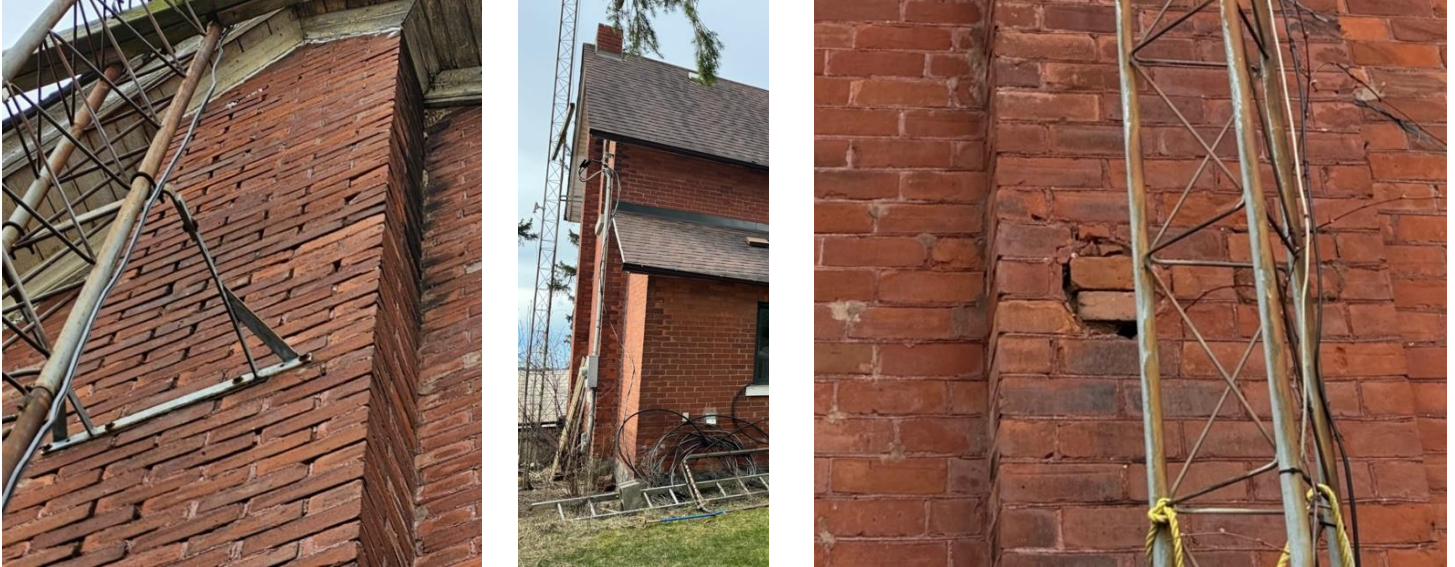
Chimney grouting between bricks eroded away with chimneys appearing to lean in-towards itself.
